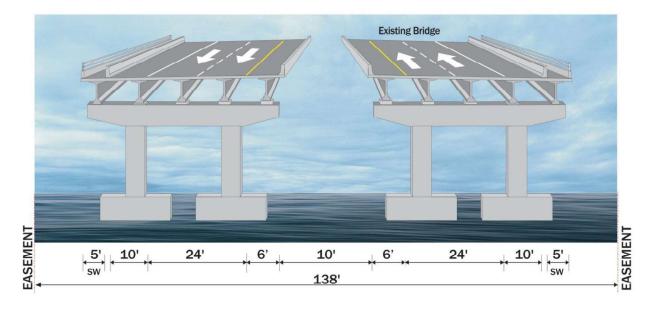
RYE ROAD ALTERNATIVE TYPICAL SECTIONS
